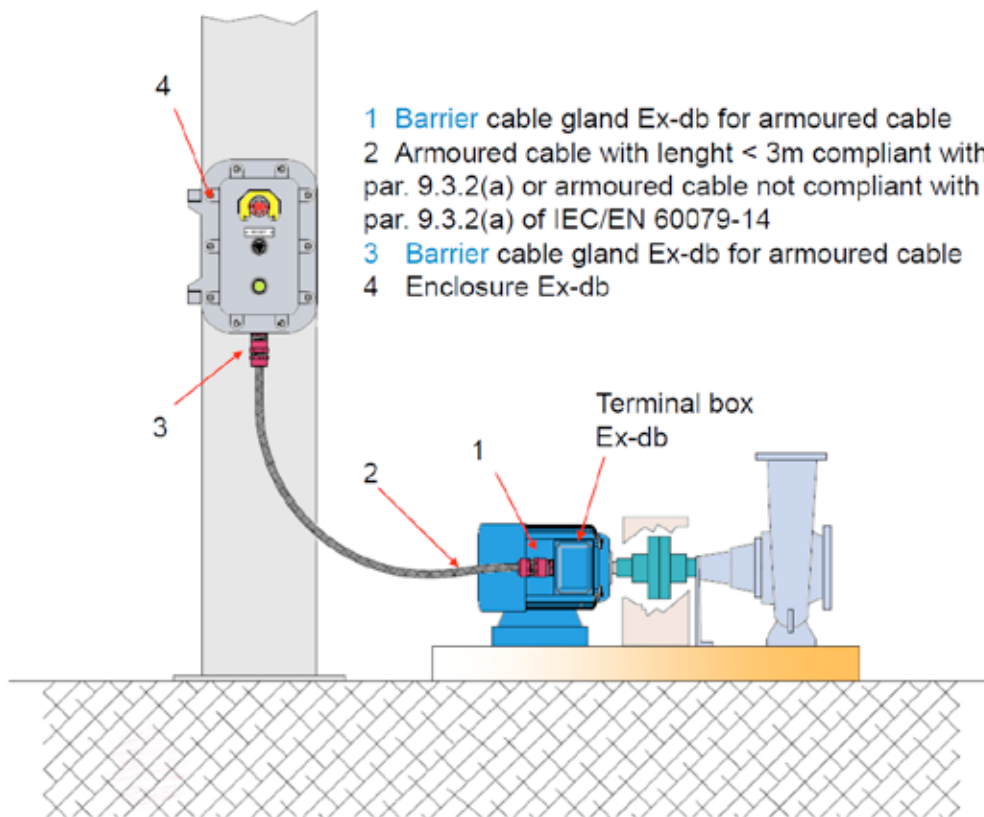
Example of connection of a vibrating machine with barrier cable gland
